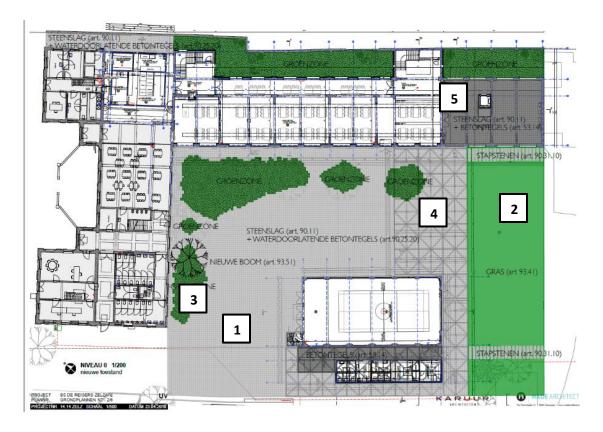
Ground plan of the playground of 'BS de Reigers' with the interventions: permeable slabs (1), grass turf planting mats (2) planting an additional lime tree (*Tilia* spp.) (3), installing an awning with a green roof (4) and installing a green wall (5).
